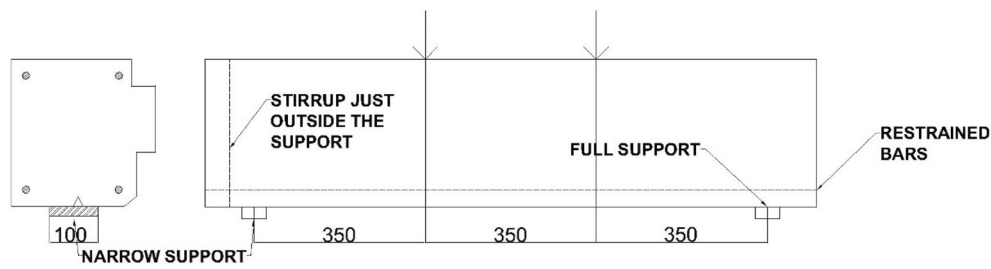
Directly supported four-point-bending test setup. Dimensions are in mm.
